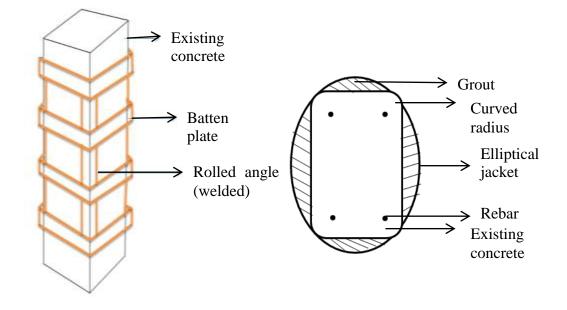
(a): Column with steel jacket Figure 2.2 (b): Elliptical steel jacket
